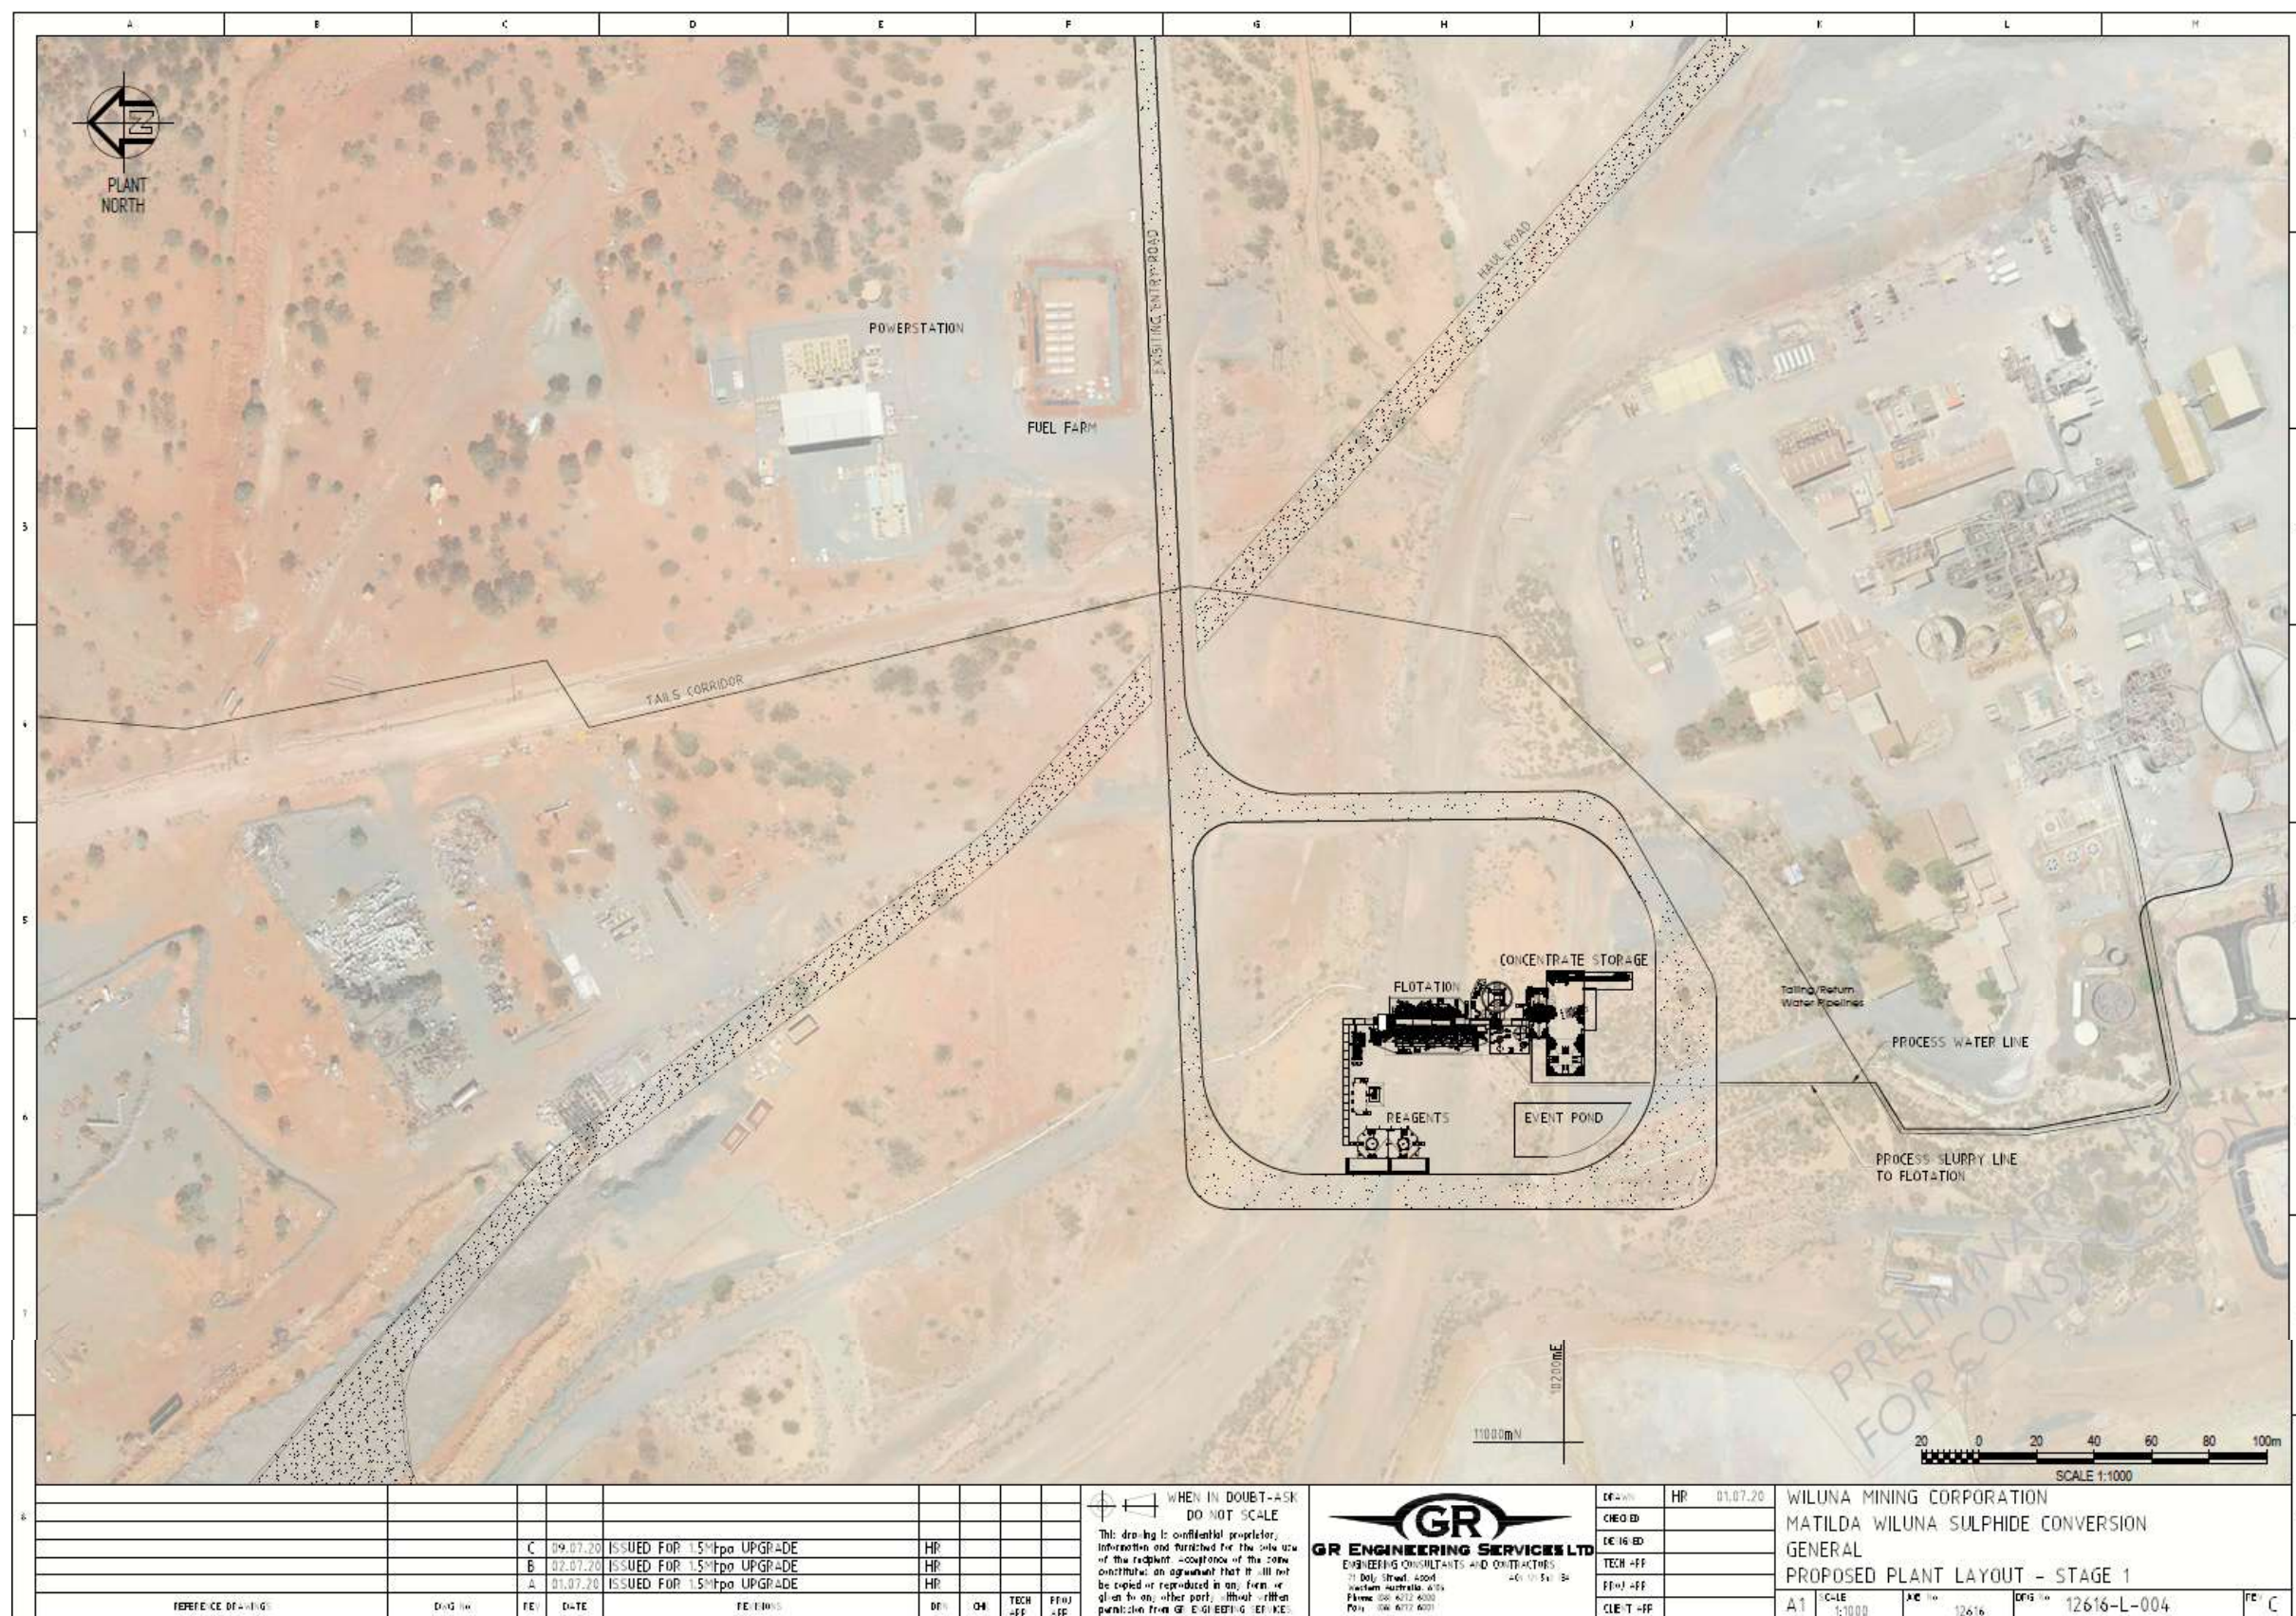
General Arrangement Layout of Sulphate Ore Processing Facility, Reagent Facility, Pipelines and Existing Facilities that will be utilised.
